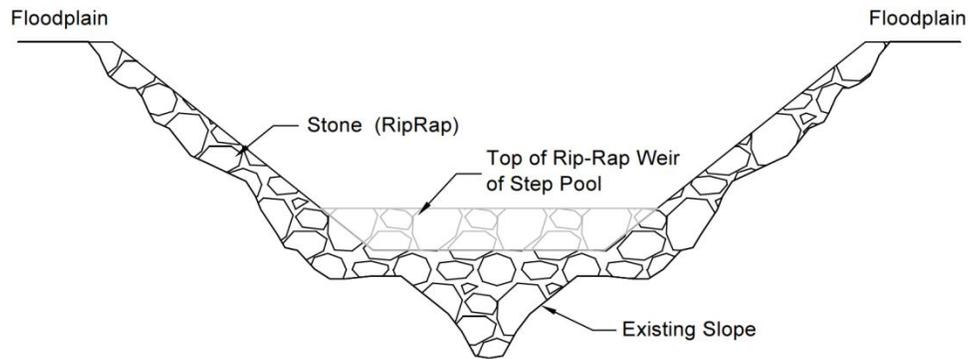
Step-Pool Cross-Section Concept Design (Not to Scale)
